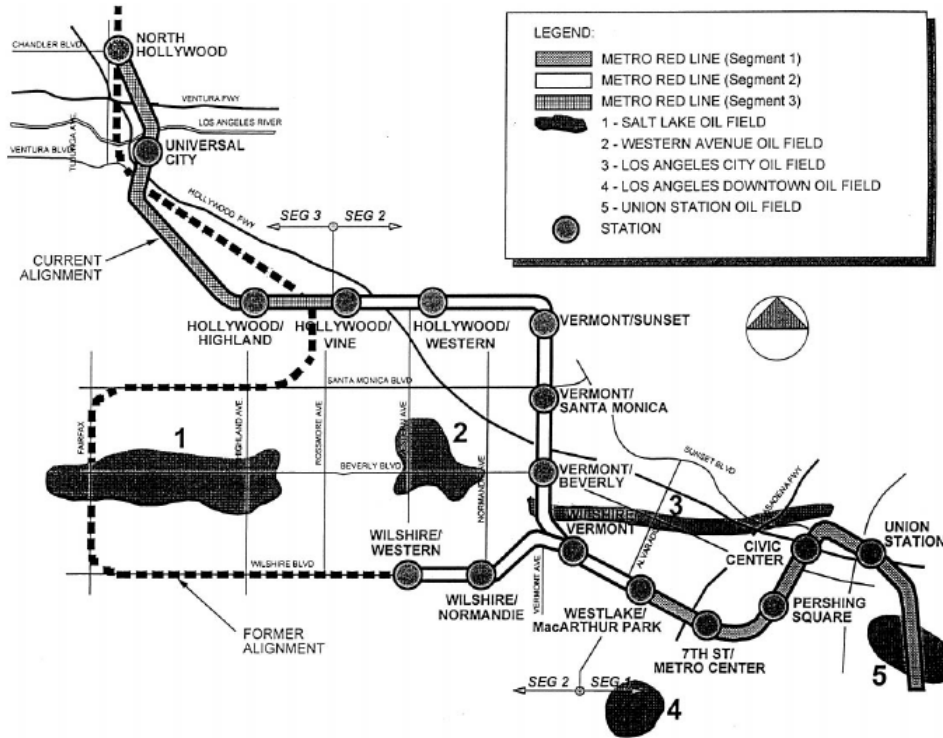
Layout and stages of construction of Los Angeles Red Line (Stirbys et al., 1999).
